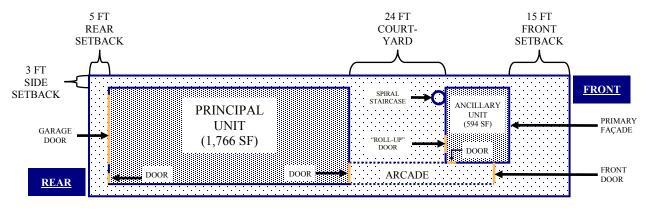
Casita First Floor Footprint on 30' x 120' Lot
